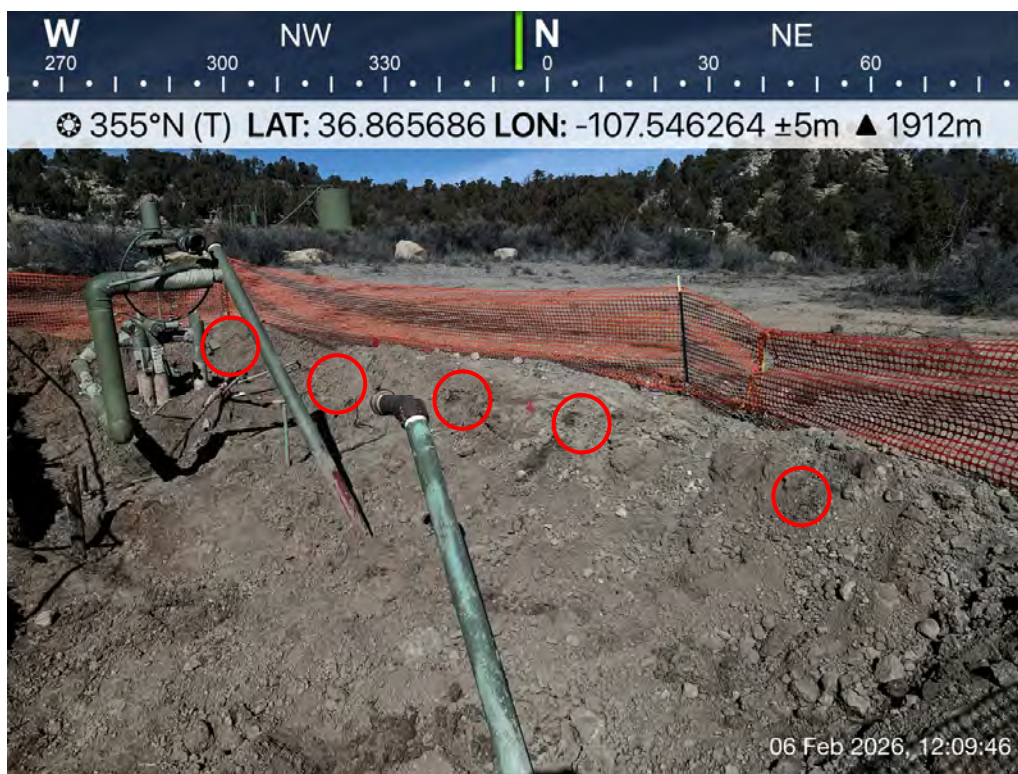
SS20 collected as a 5pct sample from the northeast sidewall of the POR excavation.
